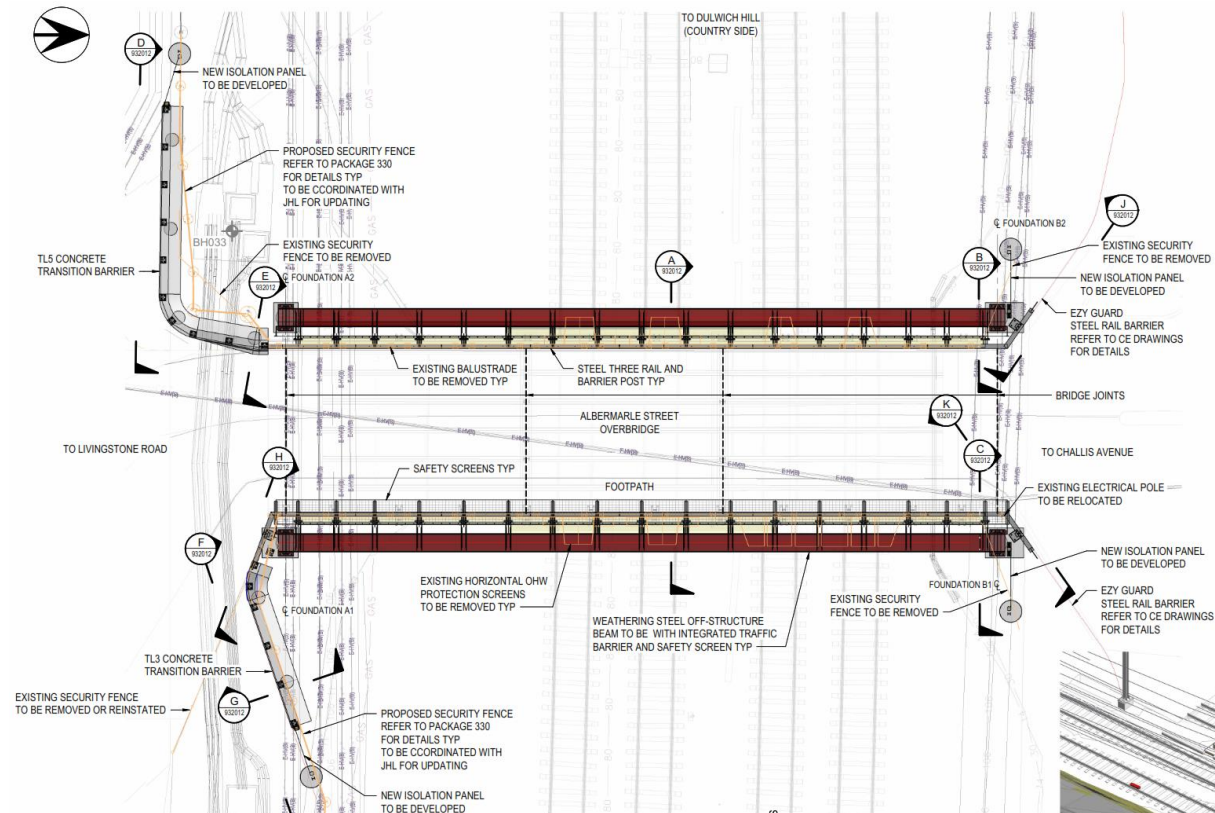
Plan of treatment works for Albermarle Street Bridge (Source: Aurecon 2024, provided by ARCH Artifex)
